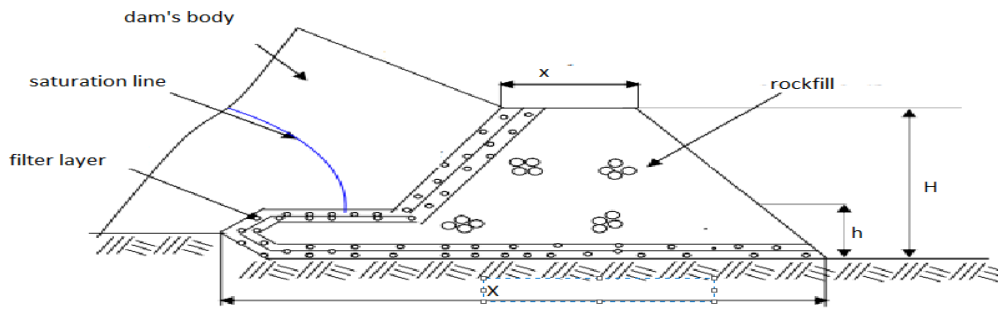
Prismatic drain with horizontal drain with impermeable foundation, (Messaid, 2009)
